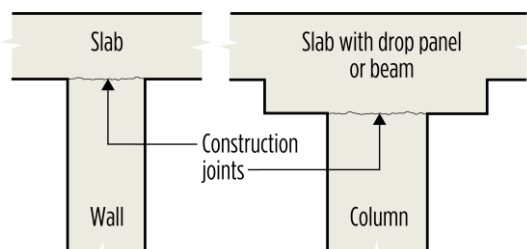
Construction Joints between Horizontal and Vertical Elements
